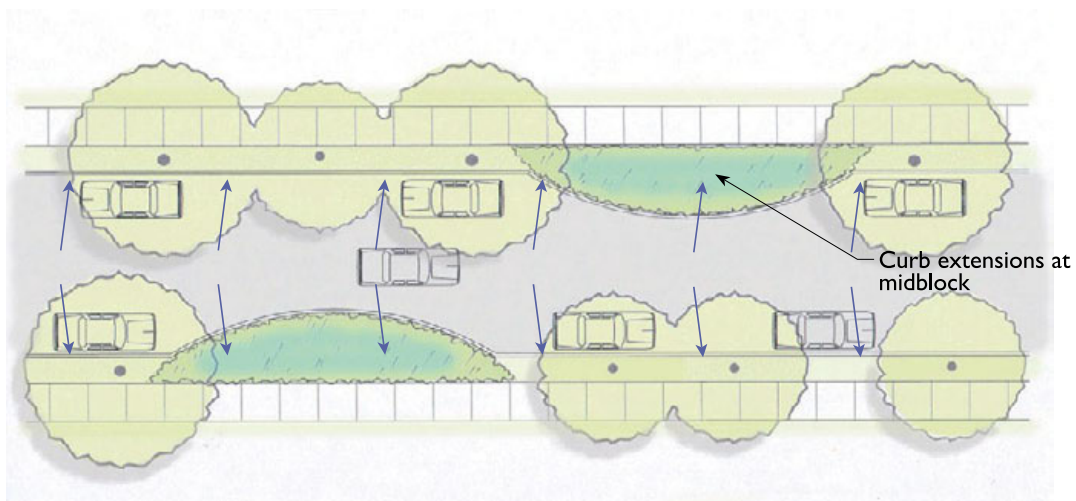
Mid-block curb extension (staggered layout)—plan view.
